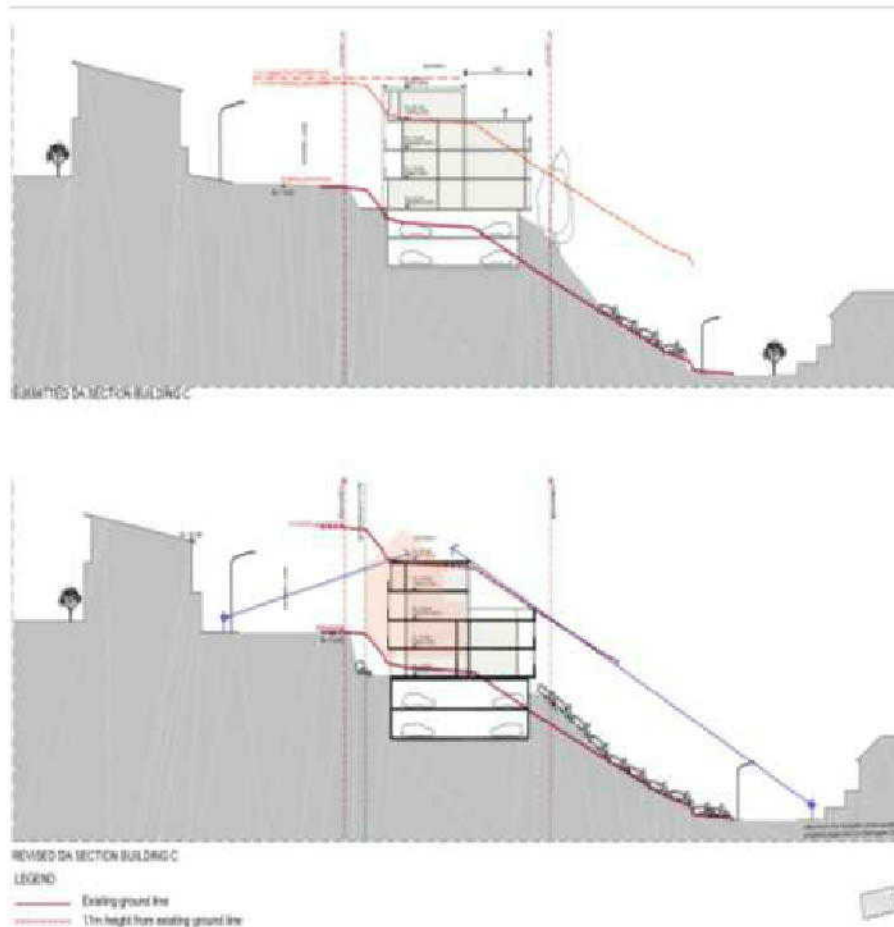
Before and after sections showing natural ground line, height control and view lines from Mobbs Lane and Carrington Avenue for building C.
